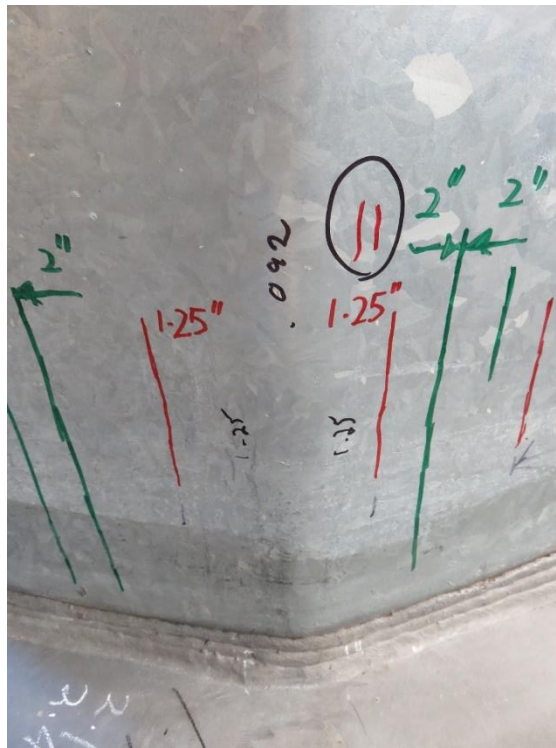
State of Cracks: Specimen 33-3-12-TX-A2 – Bend 11
